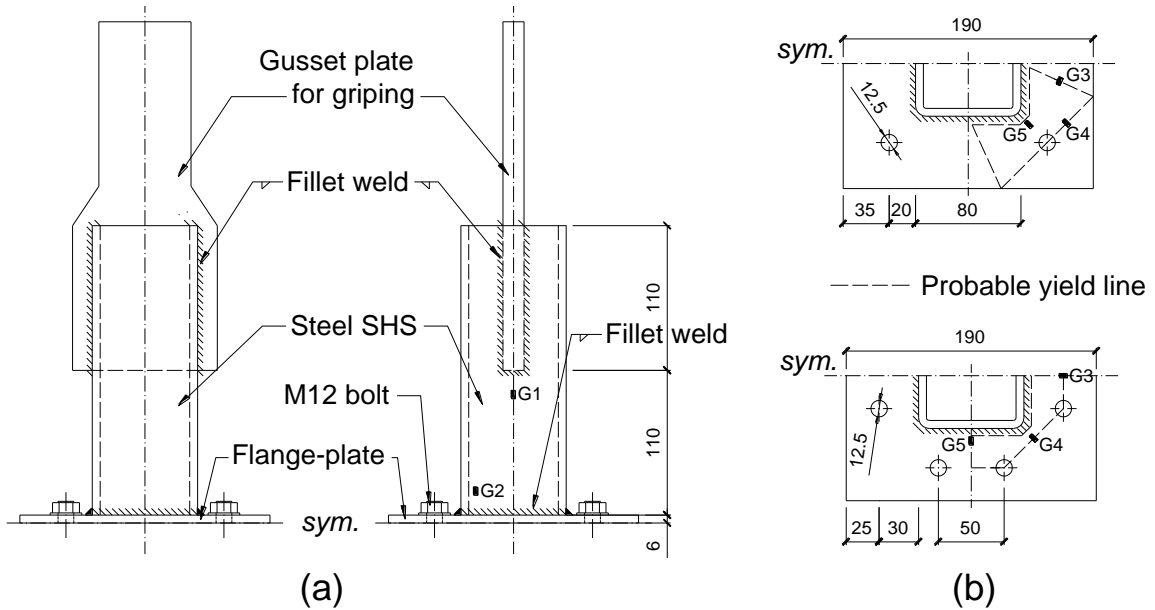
(a) Front and side view of a BFJ-4 specimen; (b) plan views of BFJ-4 and BSJ-8 and positions of strain gauges (all units in mm).
